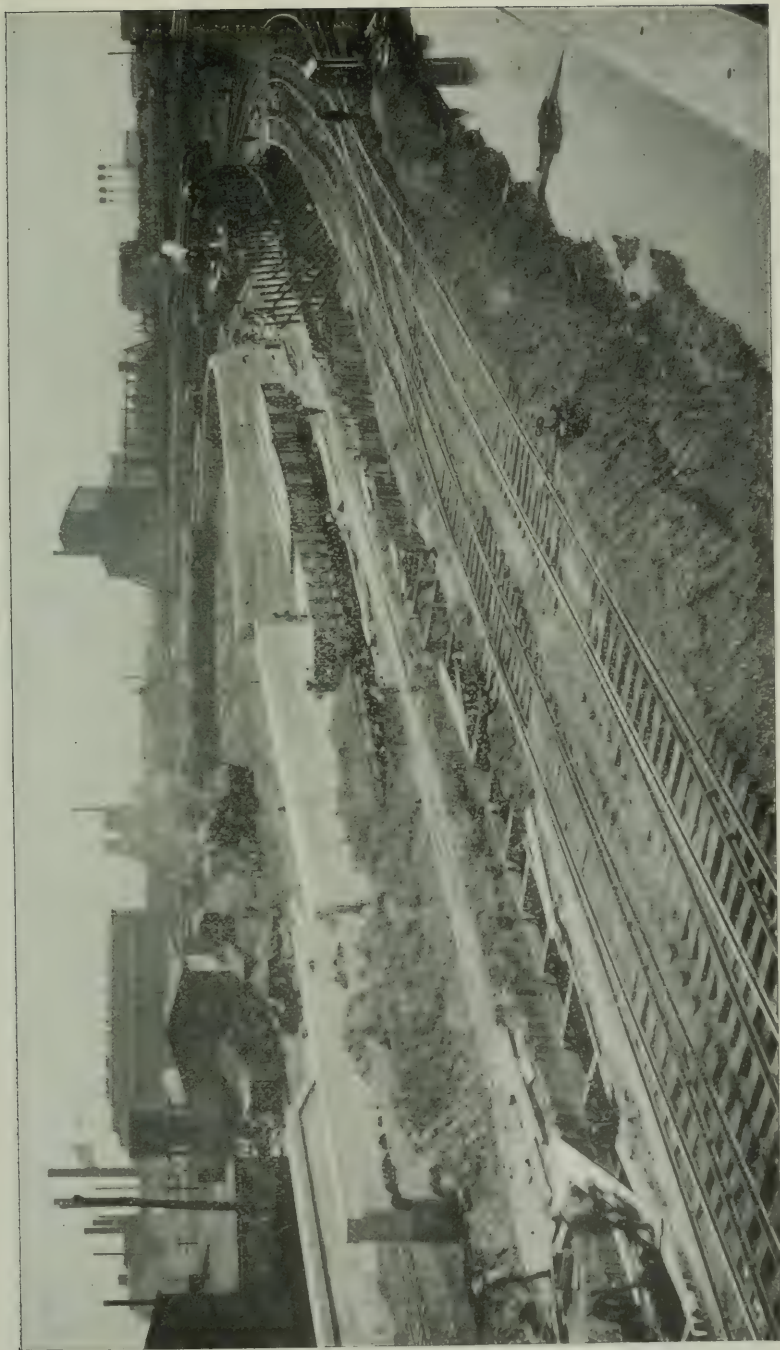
Condition of part of the Work, July 31, 1898. Shows two C. & W. I. Tracks in service before temporary Elevation of Tracks was begun. Beginning of excavation of Subway on the right. Trench excavated for foundation of retaining wall in the foreground. Santa Fe Coach Yard and 18th street Viaduct in the background.
